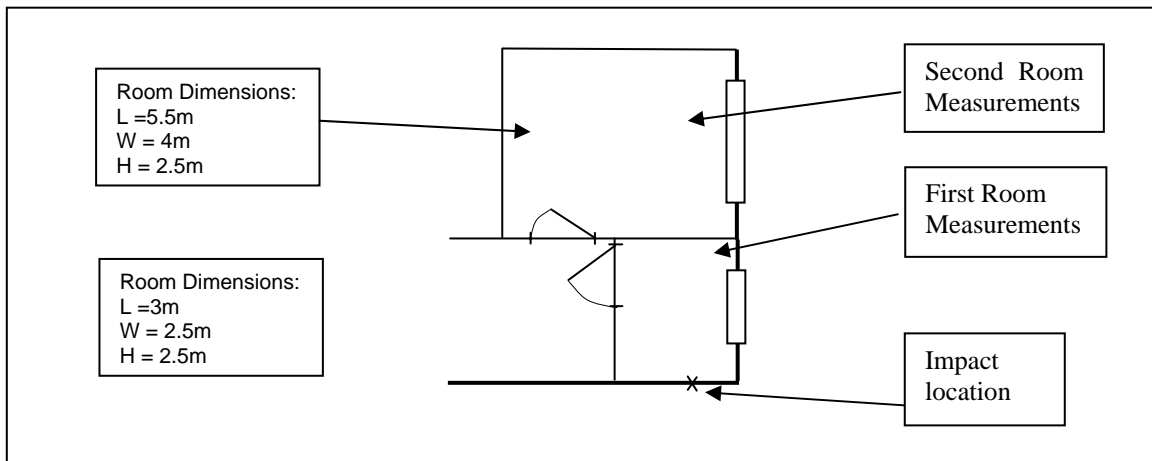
Sketch of test location at test site 4. Plan view of first floor.
